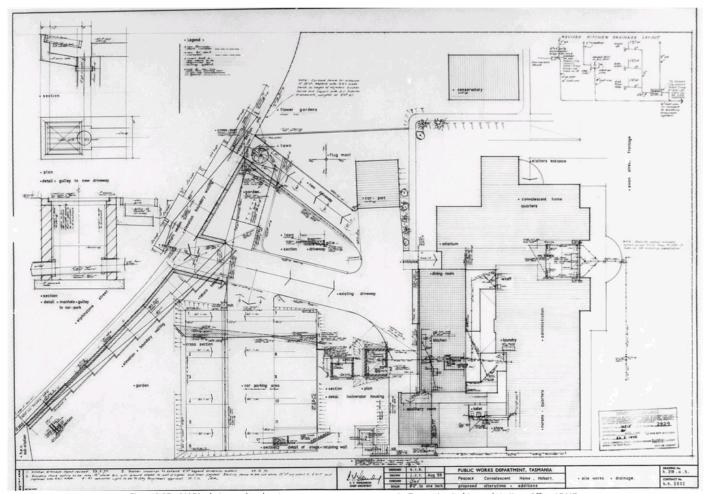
C1970s drainage plan showing new rear access arrangements. Tasmanian Archive and Heritage Office AE417.
